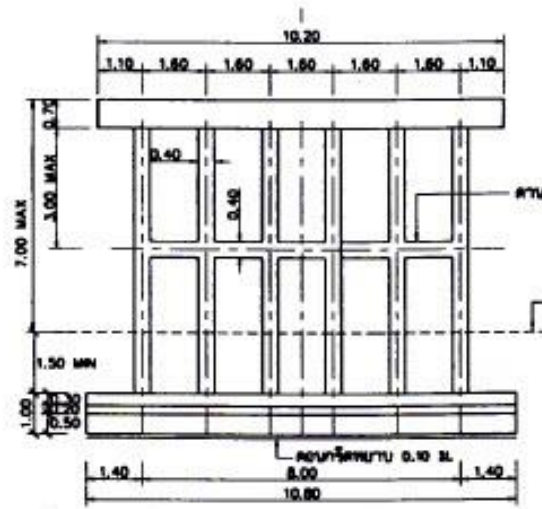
Standard Drawings for Bridge Construction (2010) from Department of Rural Roads. Kinds of span length is 10 meters
